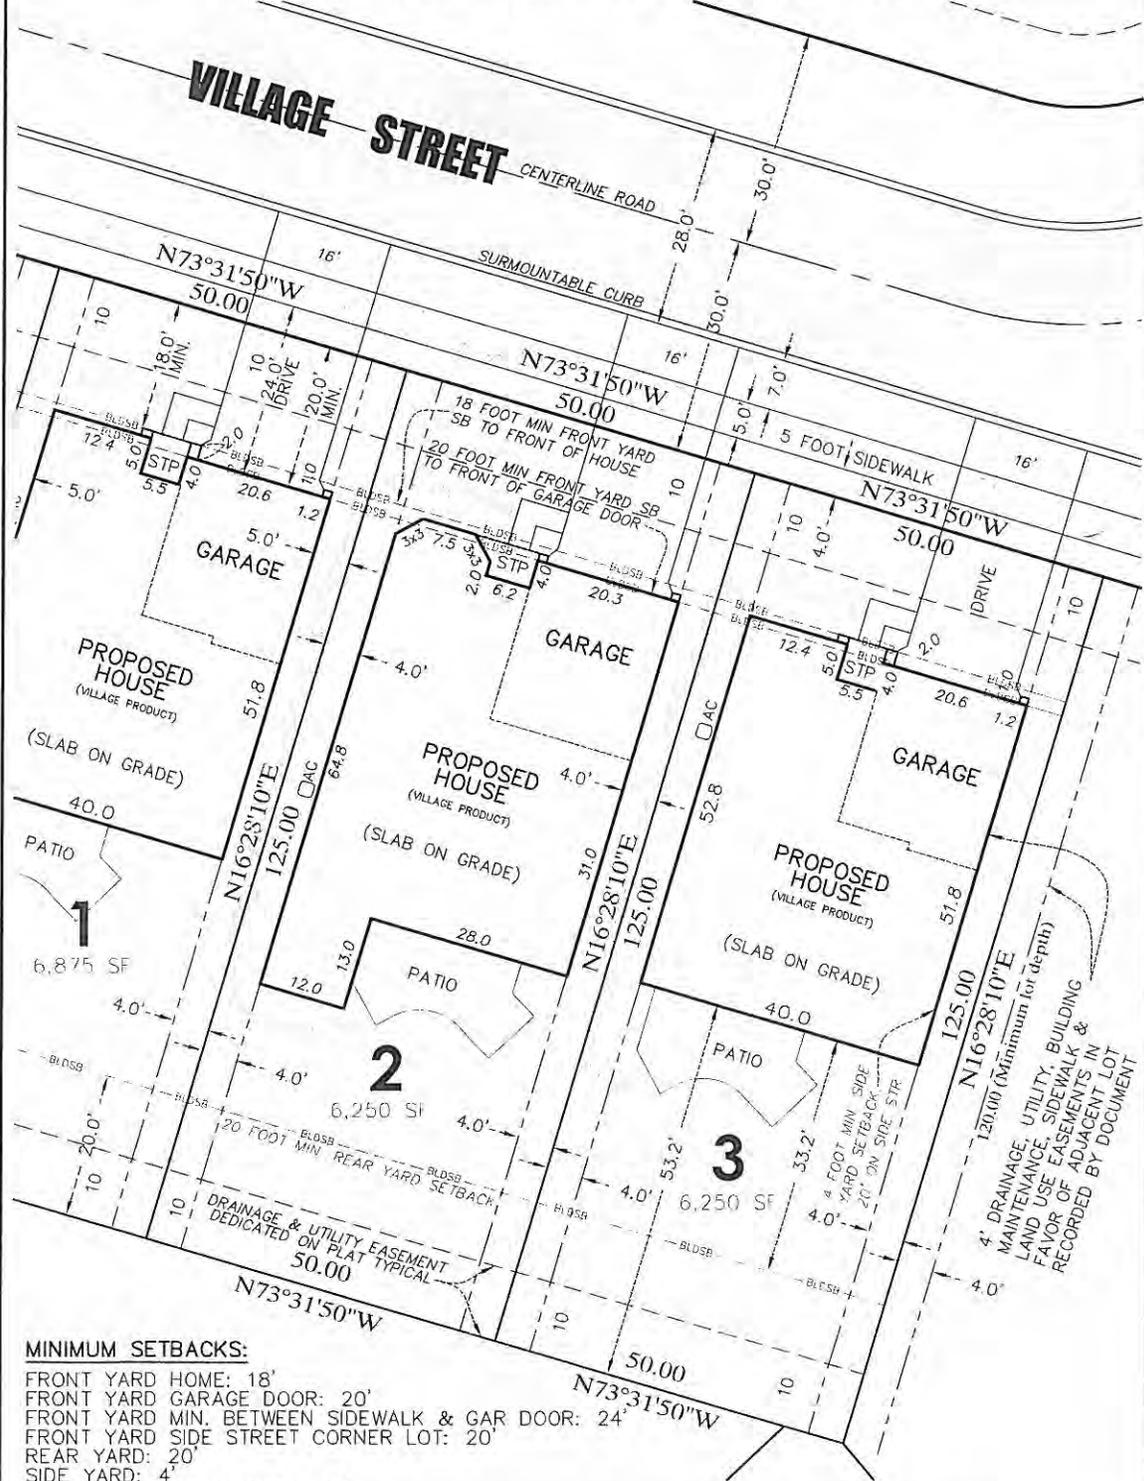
DETAIL SHEET VILLAGE PRODUCT TYPICAL
